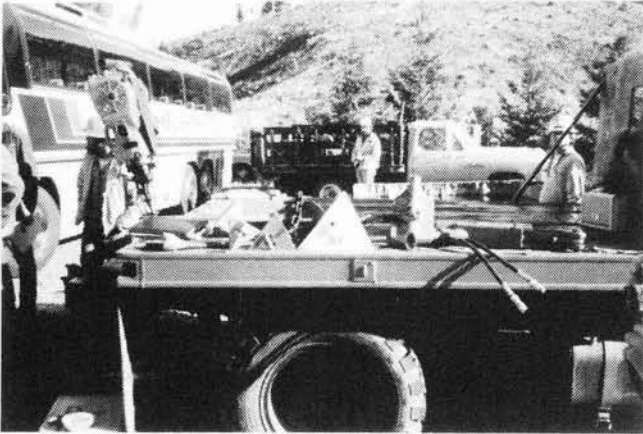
Arrowhead tipping plate anchors in centre of photo; manta ray type to right and a hydraulic hammer used for installation
